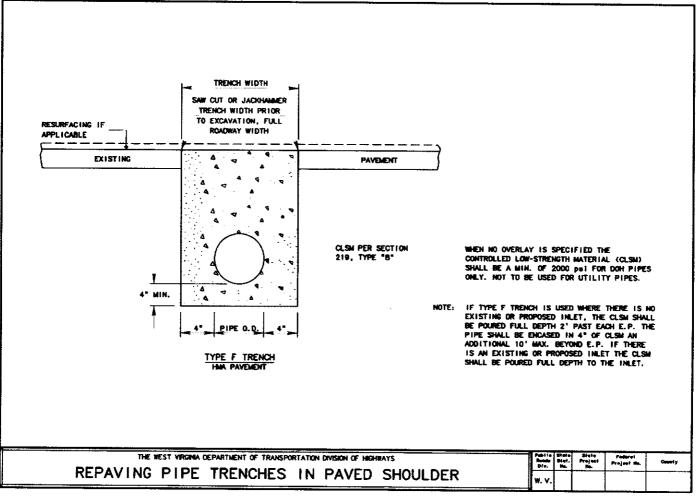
Repaving Pipe Trenches in Paved Shoulder Detail
